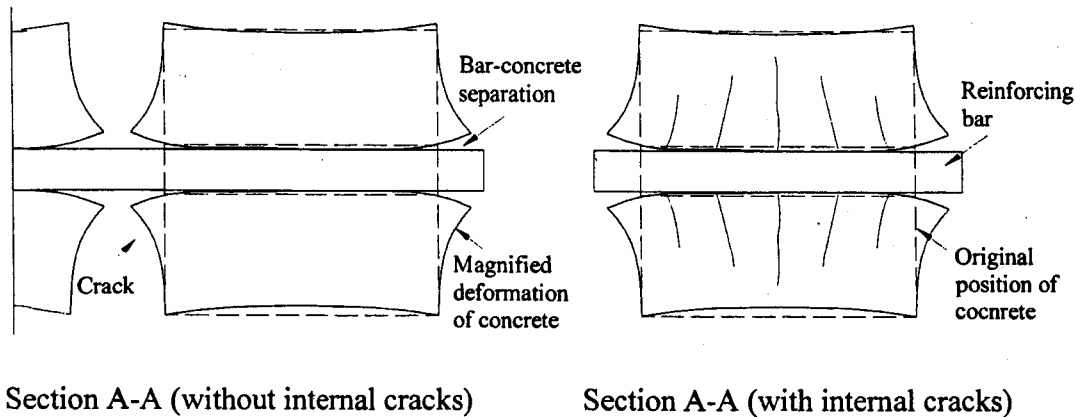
(b) Deformed concrete between transverse cracks (macro-scale)
